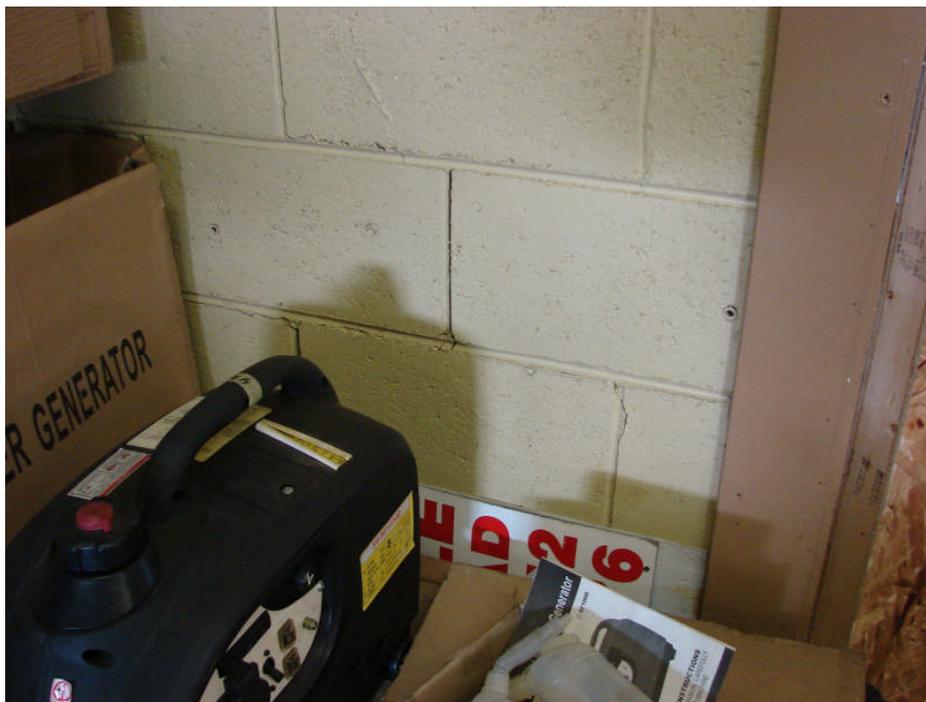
Garage Building east elevation (south part) – concrete block wall step cracking above door, typical.
